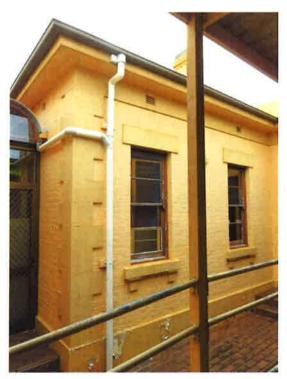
Original entrance front (east elevation) to lockup and lockup keeper's residence, showing rendered detail on front façade, including quoins, plinth, top band, sills and lintels.
